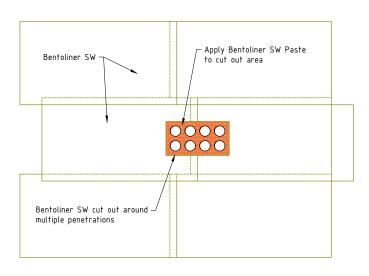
Cut BentoLiner® SW to fit around penetrations
